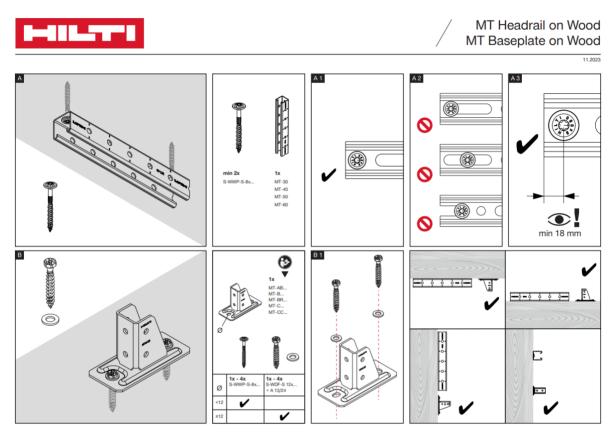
Instruction for Use (IFU) of MT system fastened on timber. Pre-drilling recommended in hard wood.
